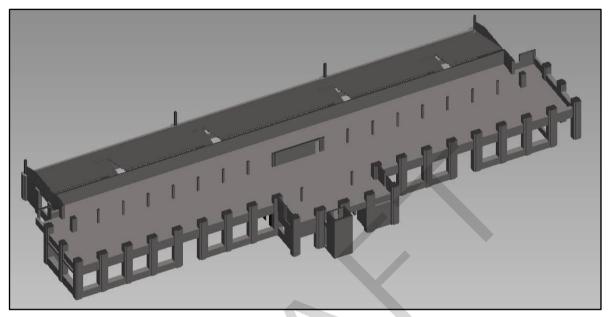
Cutaway showing walls and columns at the first floor level at GNS
